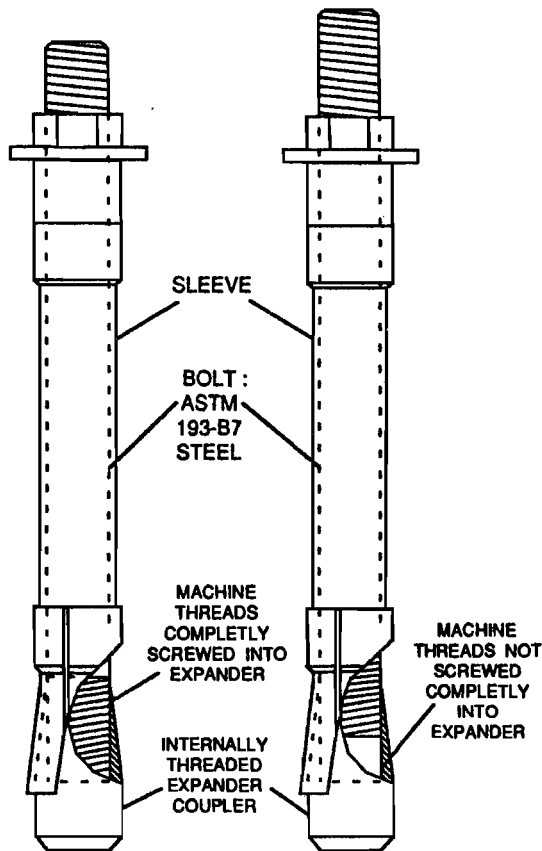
Undercut anchor with internal threads at base of anchor stud.
